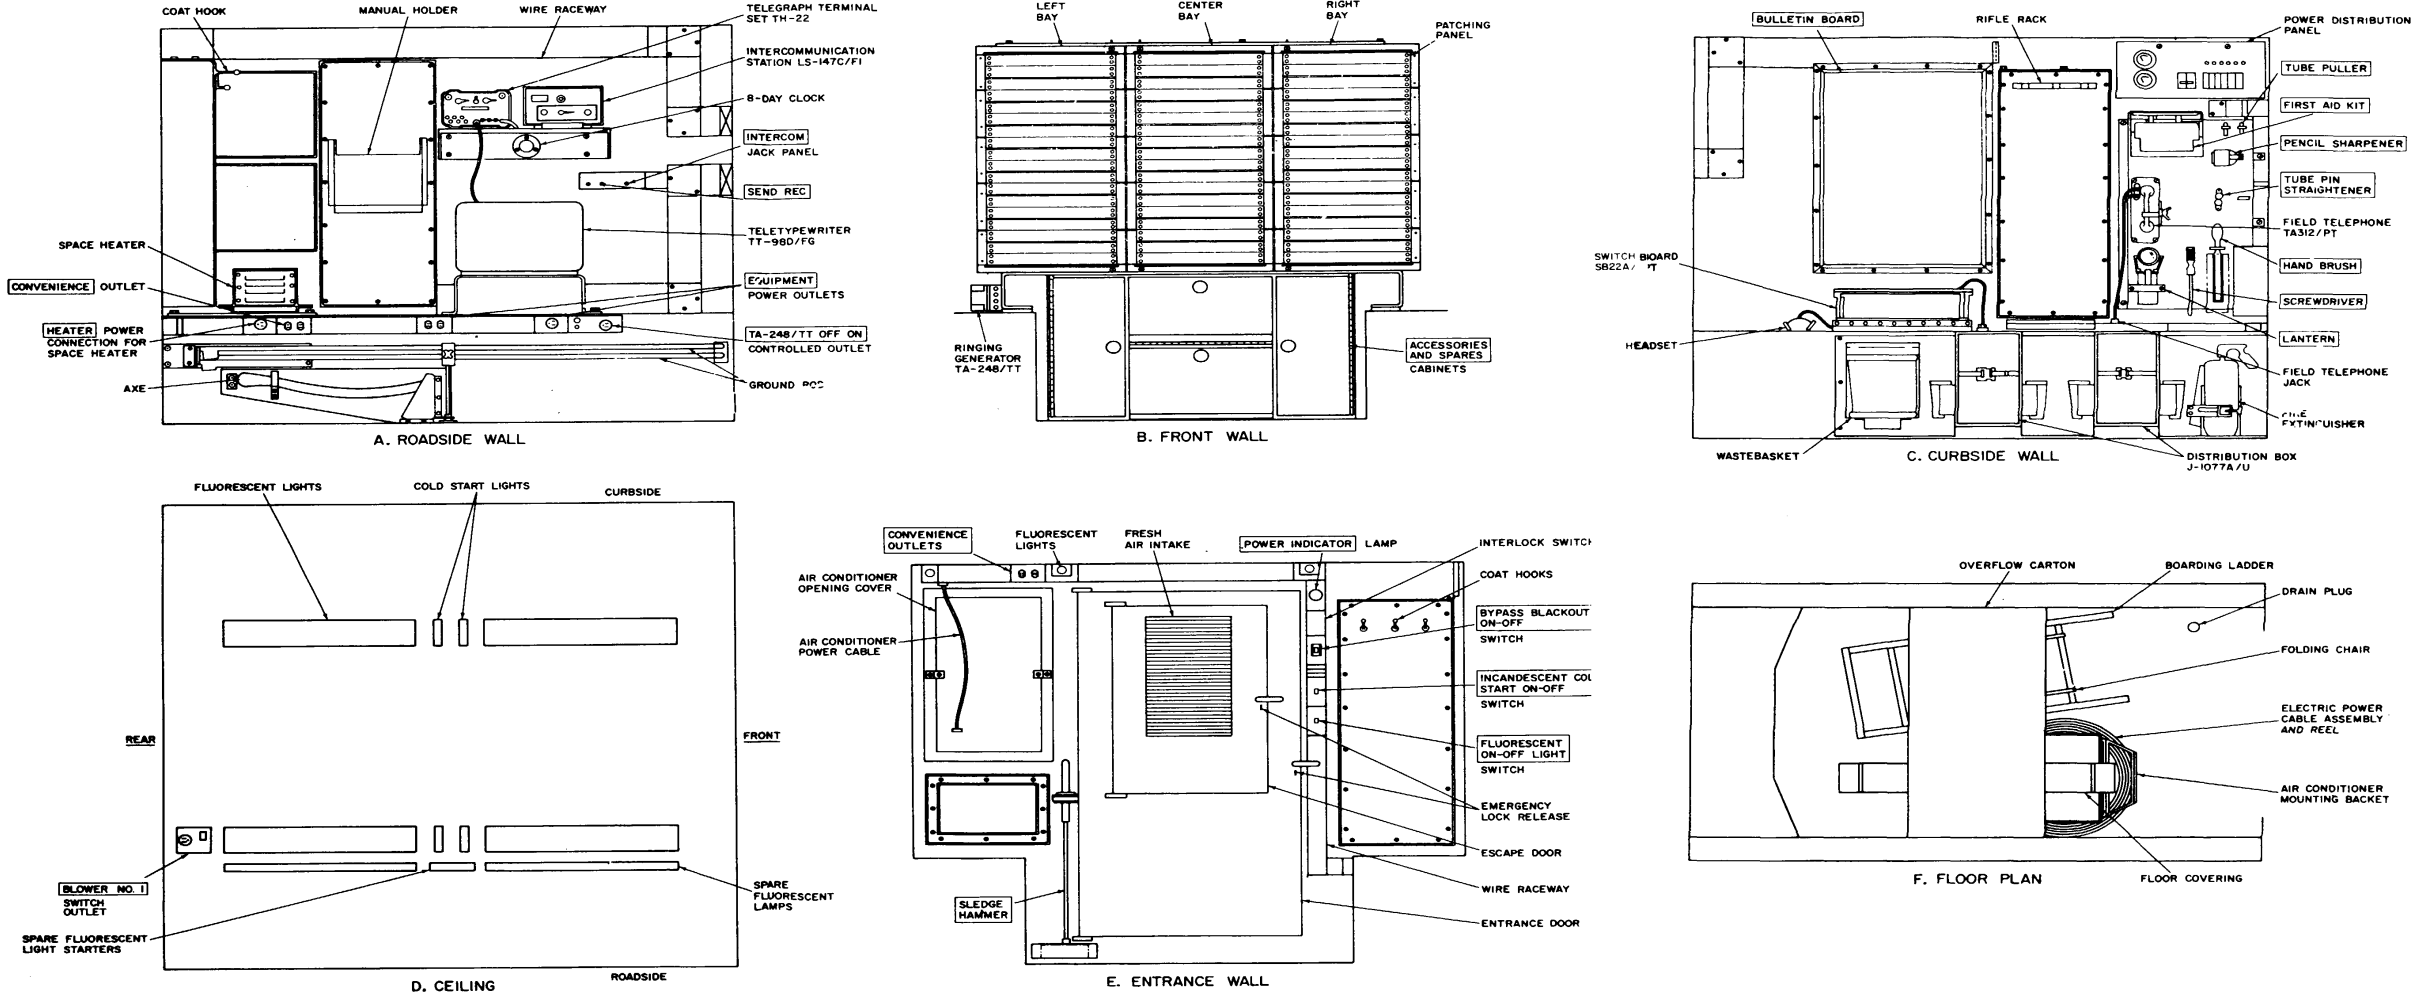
AN/TSC-76, interior floor plan and elevation diagram.
